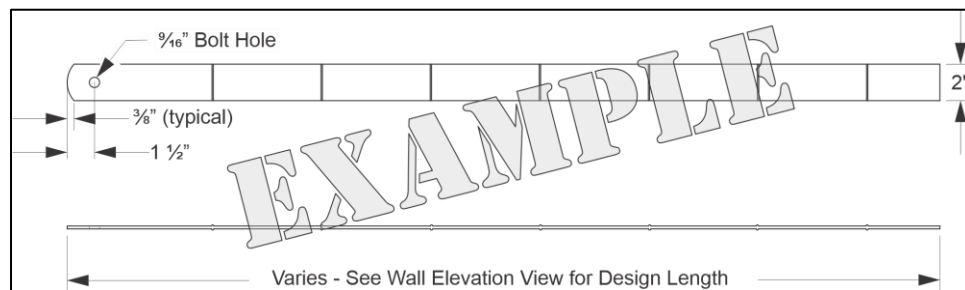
Example shop drawing for steel strip type MSE wall reinforcement
